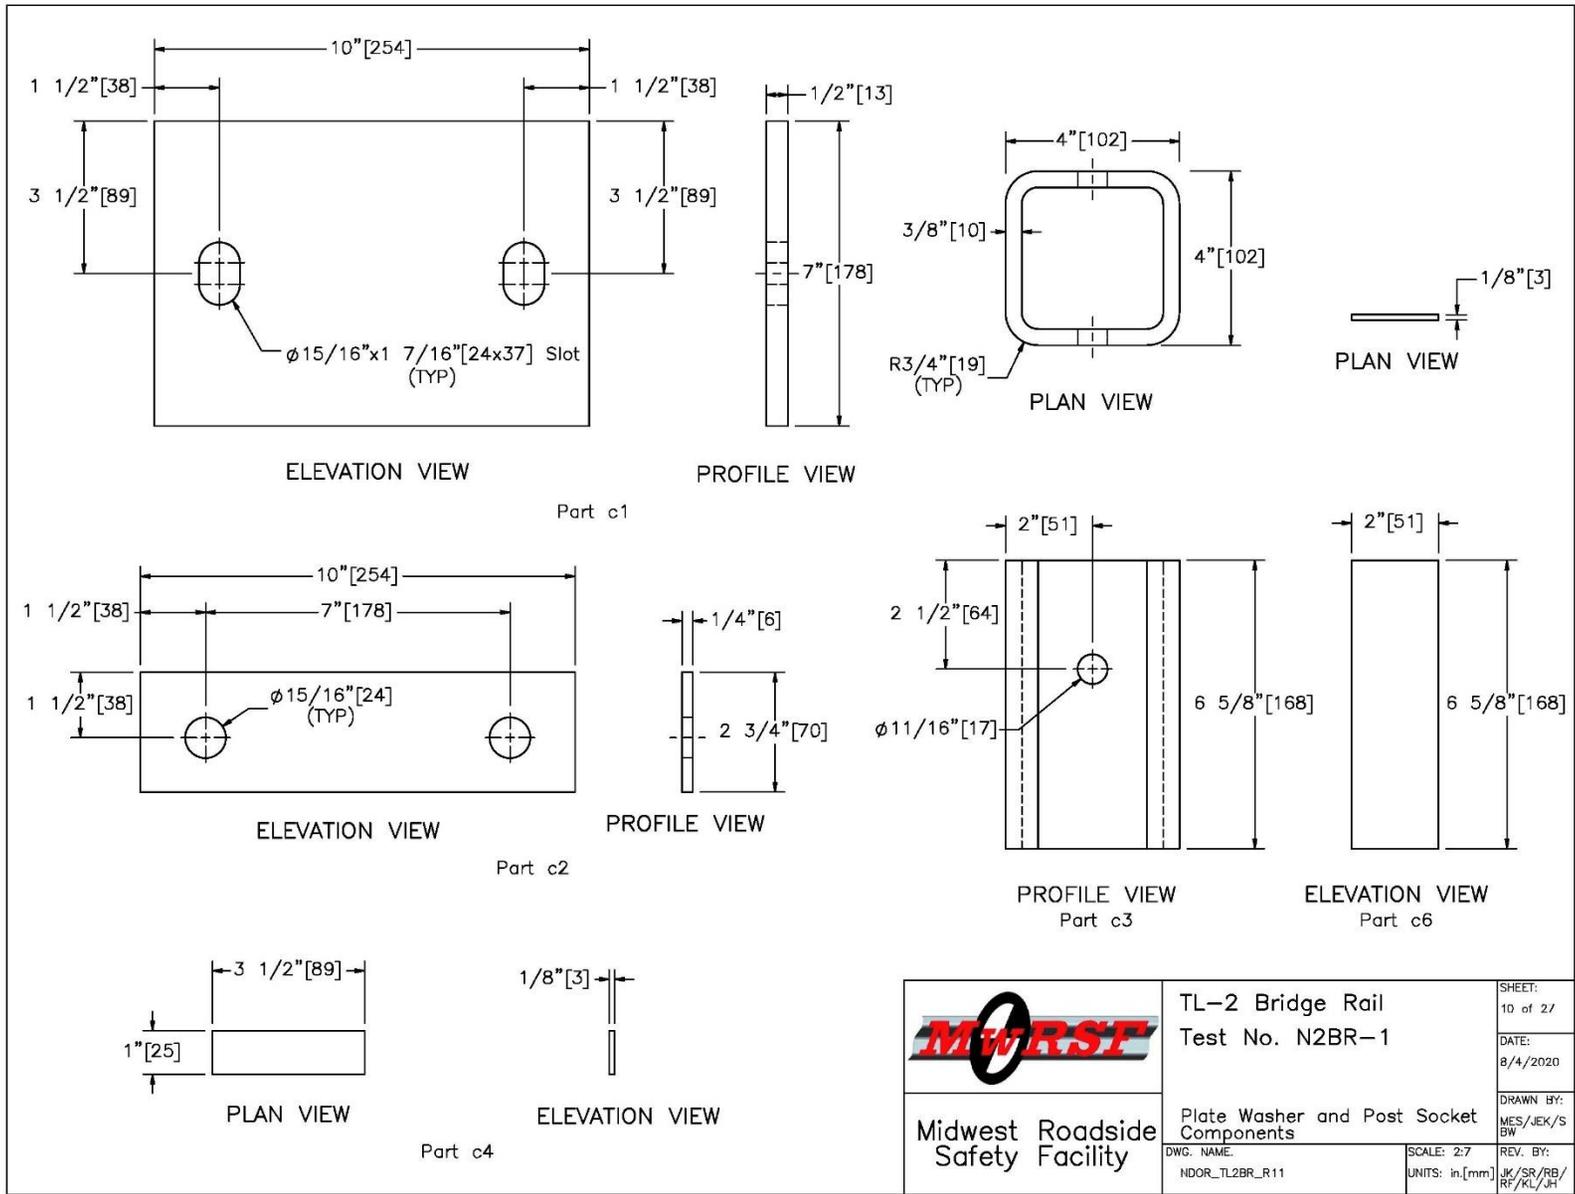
Plate Washer and Post Socket Components, Test No. N2BR-1
